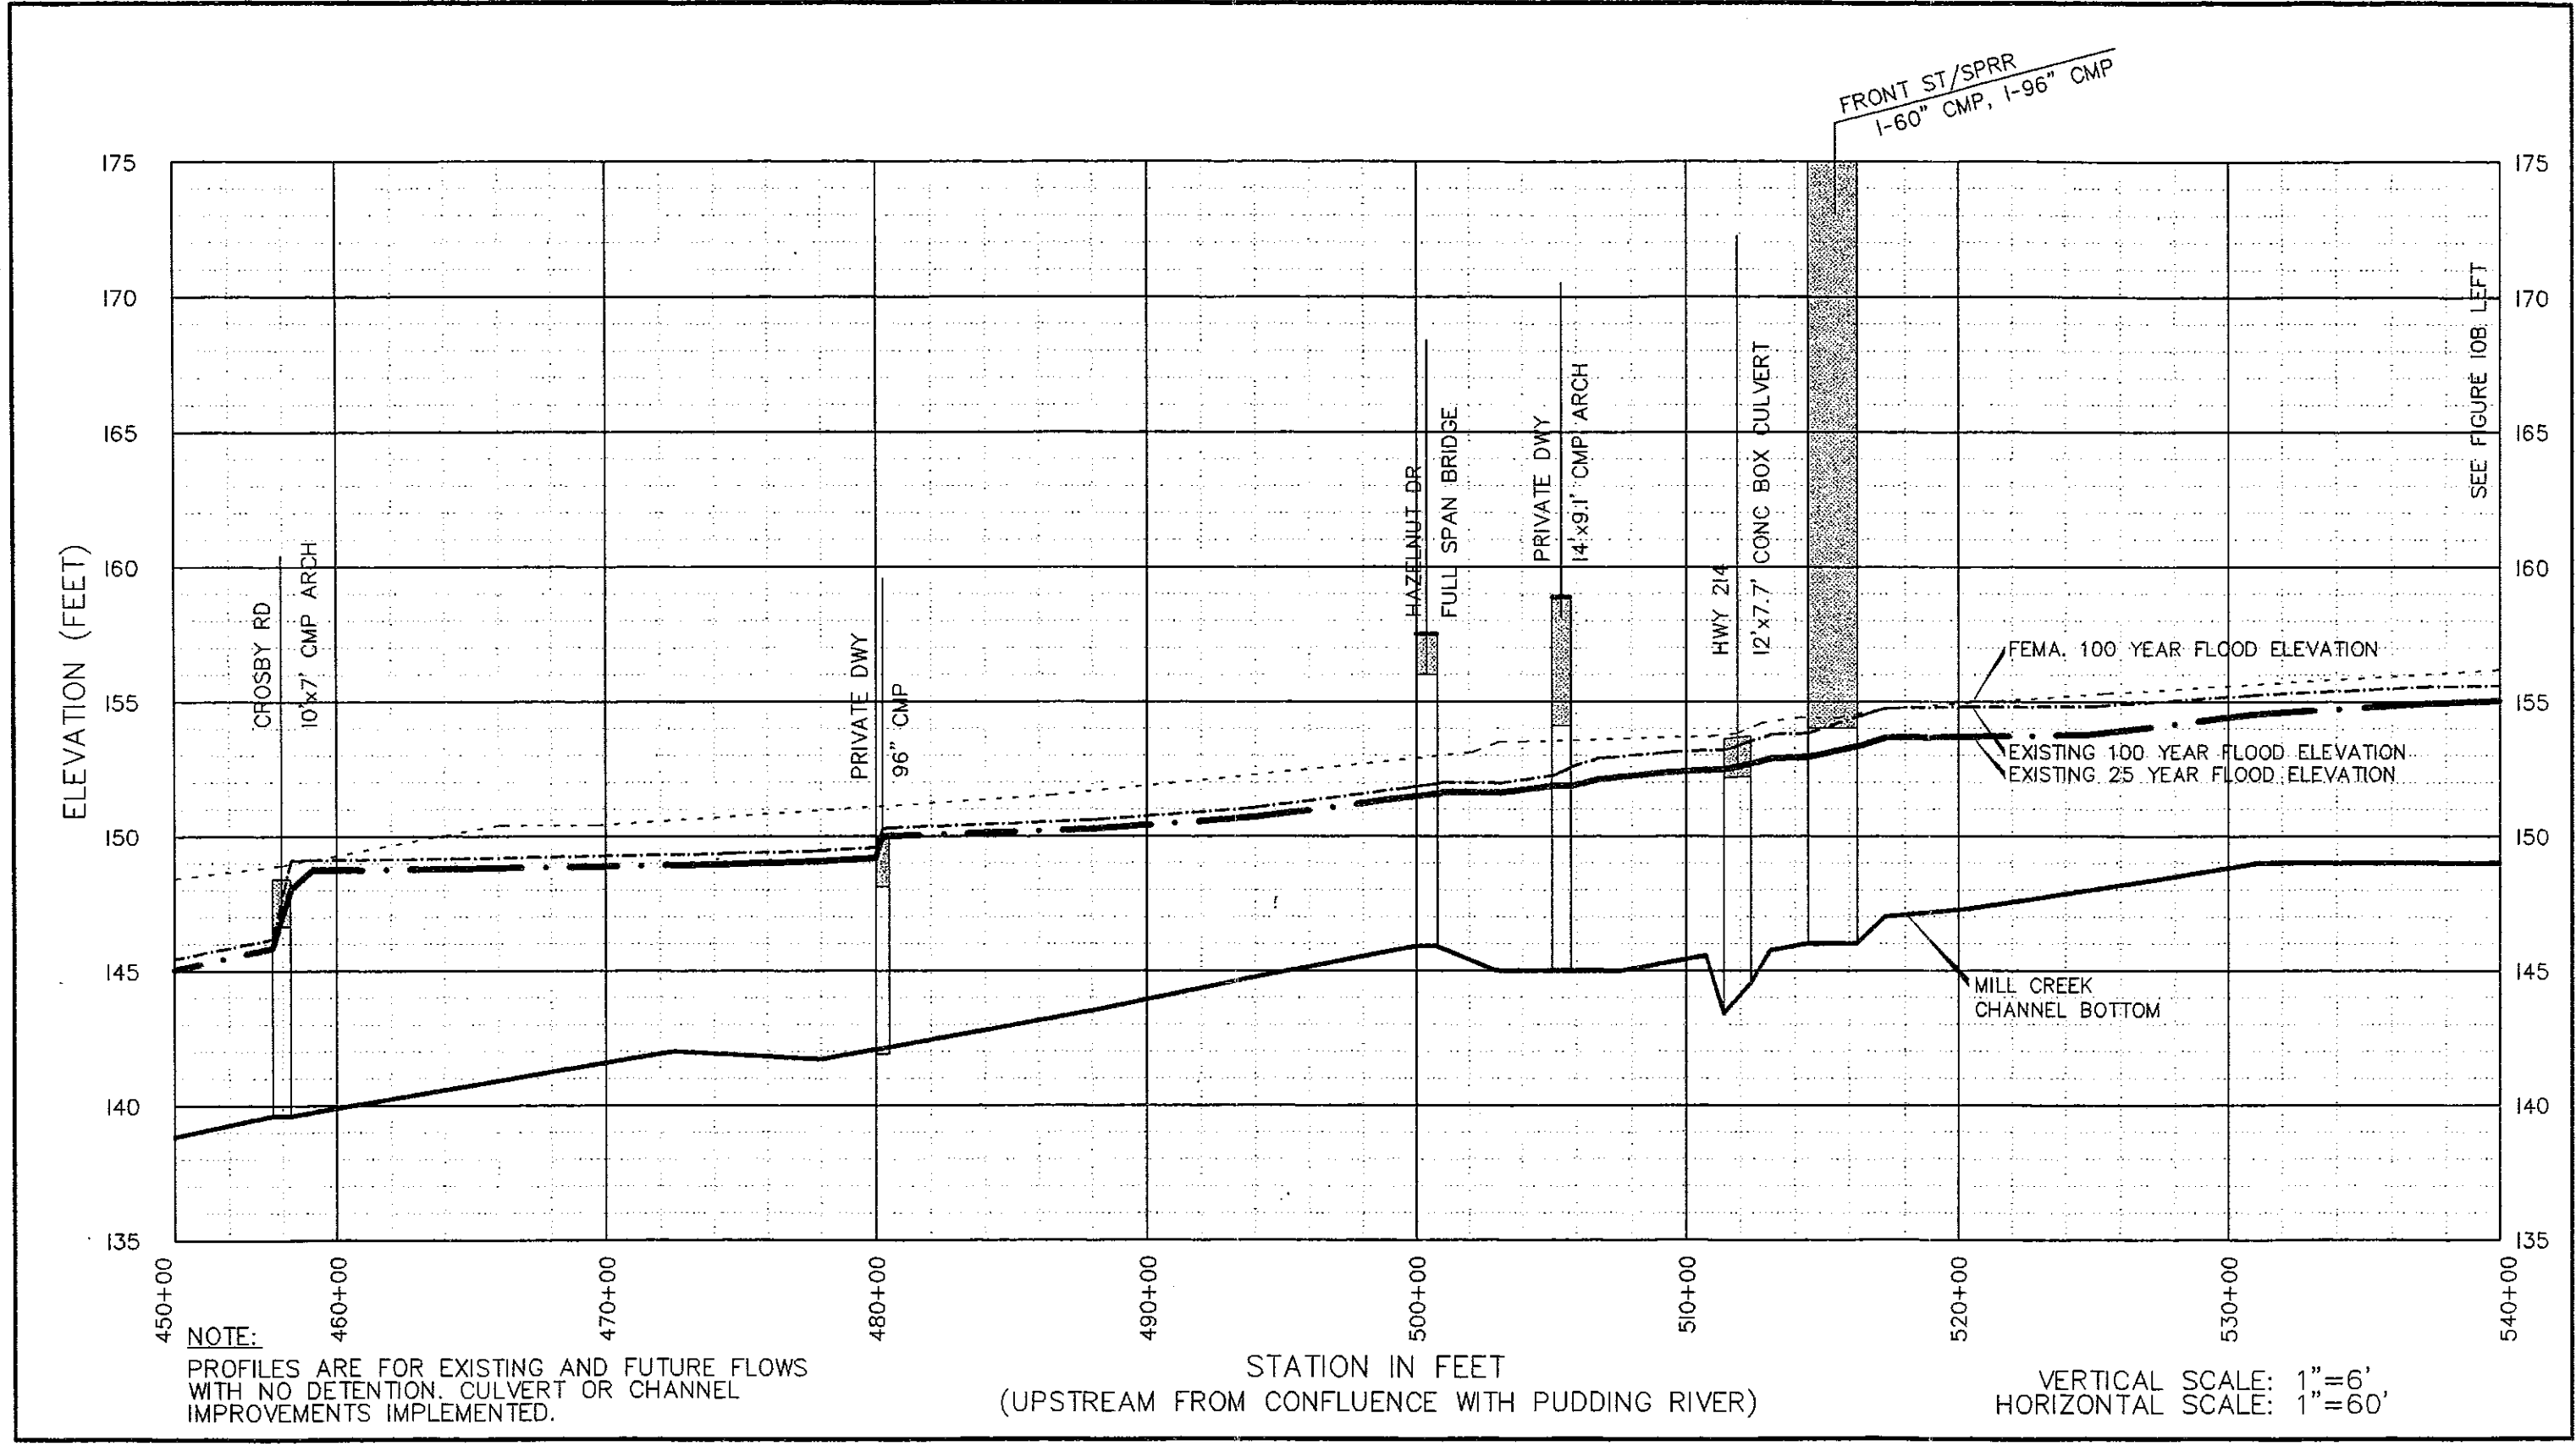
A and 10B, Mill Creek Undetained Flows Structures and Flood Profiles, show the water surface profiles for 1996 conditions for the 25- and 100-year storm events. Figures 11A and 11B, Mill Creek Detained Flows, Structures and Flood Profiles, show future water surface profiles for the 25- and 100-year storm events assuming that detention measures as outlined in this Study are implemented.
